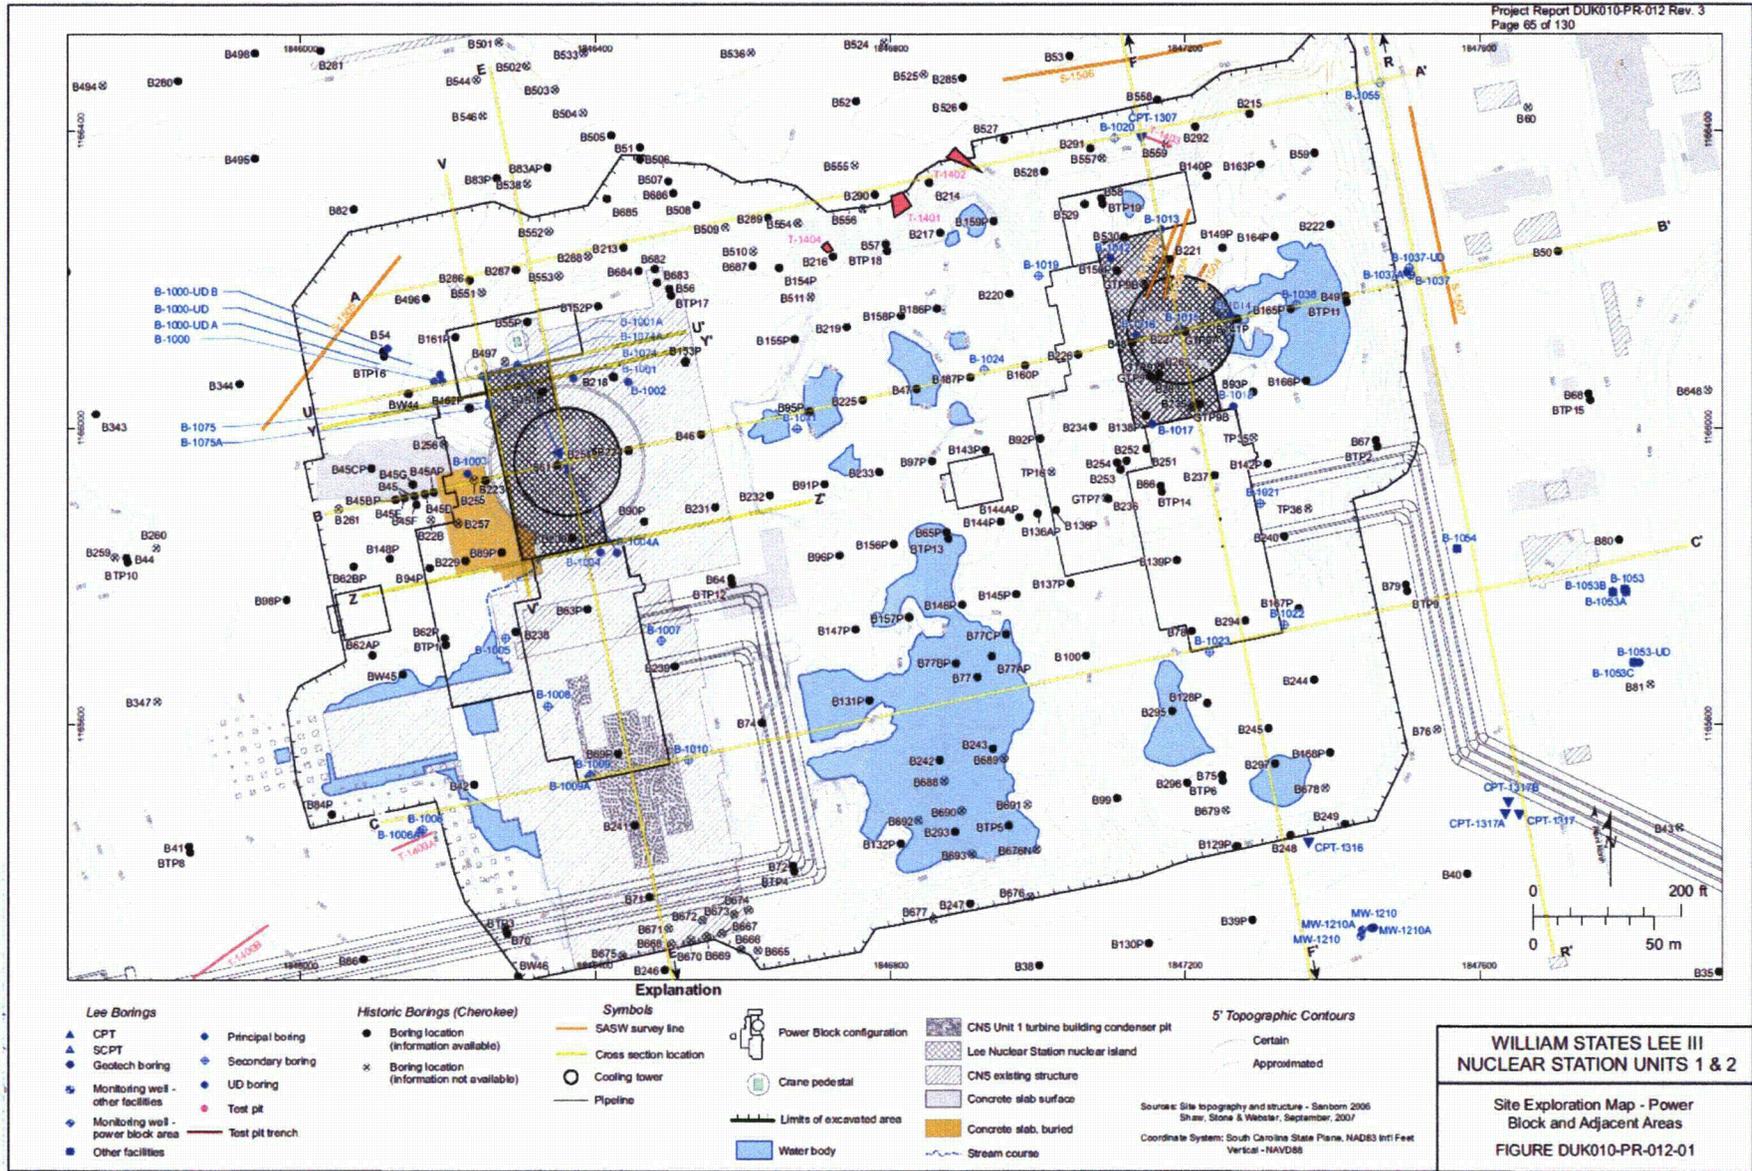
Duke Lee Site Plan – Units 1 and 2
